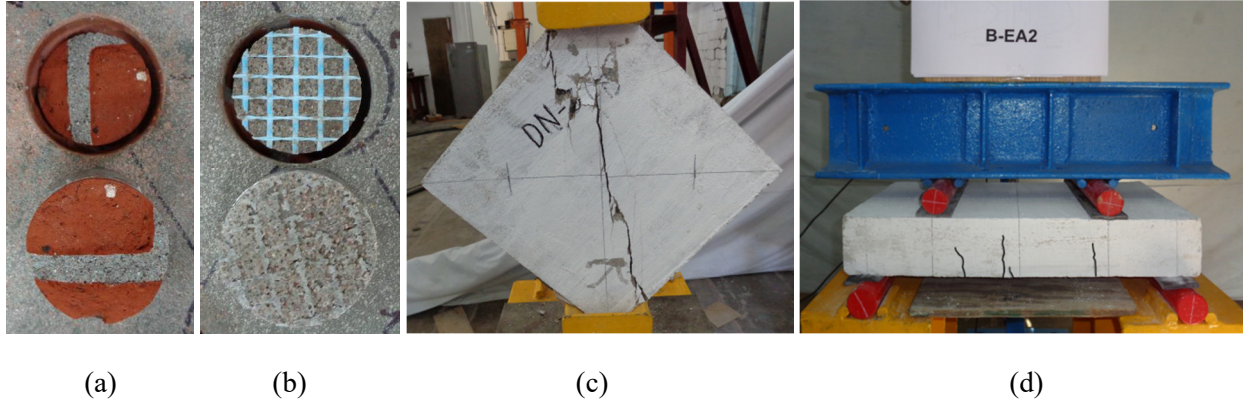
(a) Bond test – Cohesive failure in direct application, (b) Bond test – Interlaminar failure in sandwich application, (c) Diagonal tension test – Specimen DU at failure, (d) Flexure test parallel to bed-joint – Ductile failure of specimen SA.
